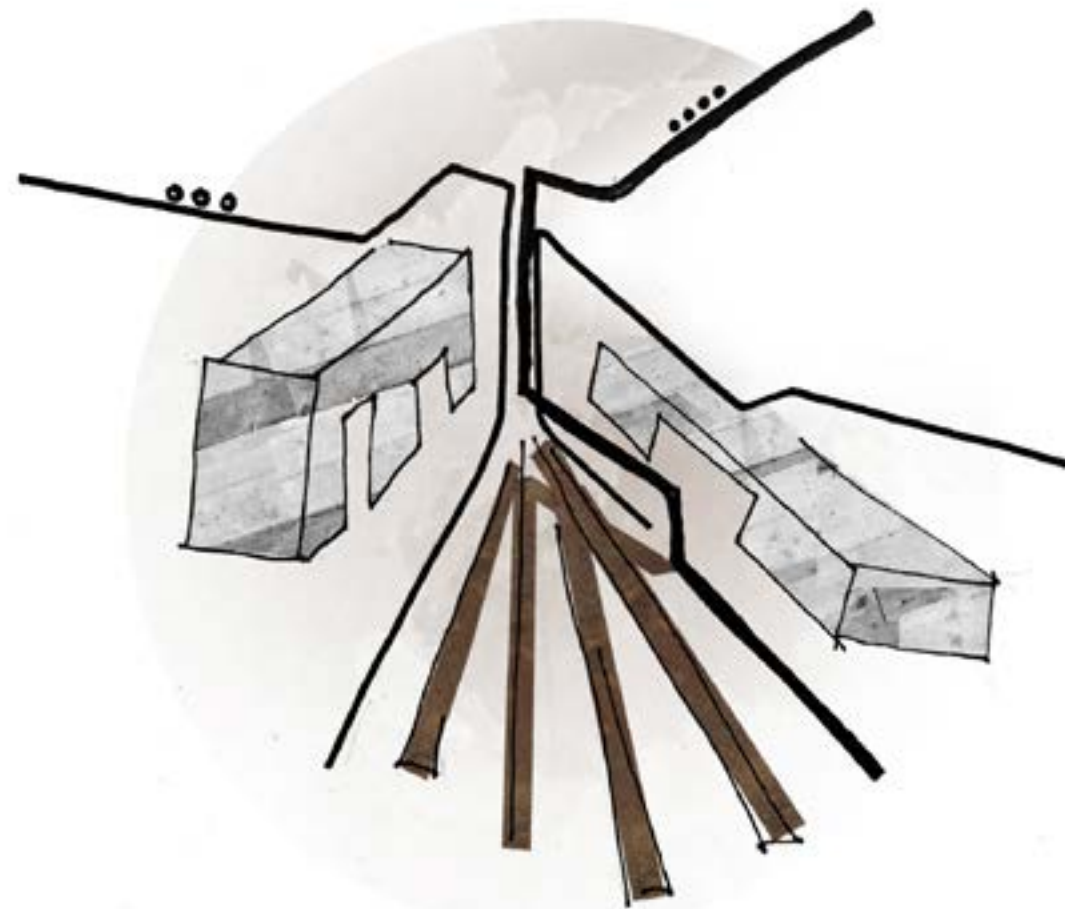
H: Architectural approach to joints (Author, 2021)
